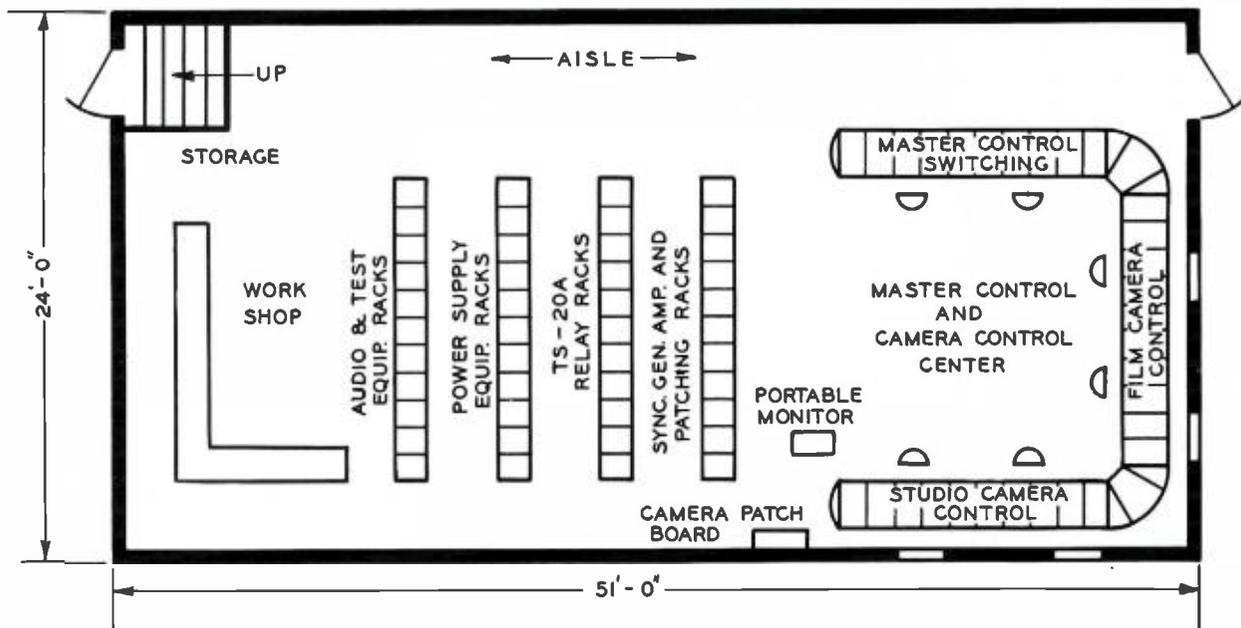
Floor plan layout of WOR-TV "Master Control" and "Camera Control Center" showing the arrangement of the technical facilities.
